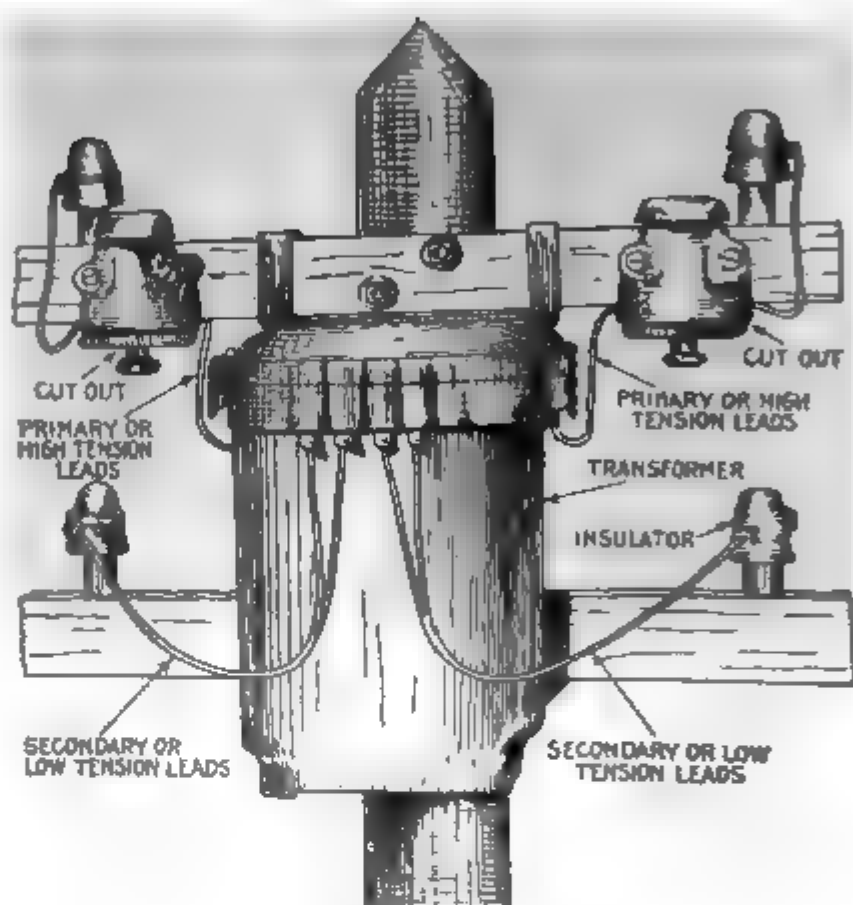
,030.—Installation of a transformer on pole; view showing method of attachment disposition of the primary and secondary leads, cutouts, etc.
